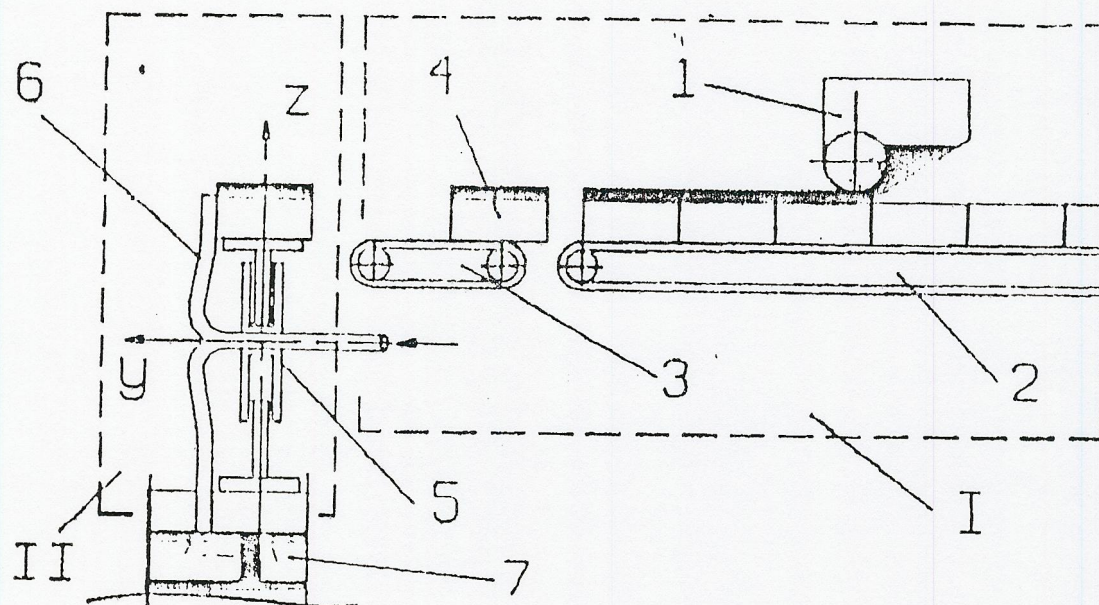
Schematic diagram of brick laying by a machine. 1 - extruder, 2 - feeder; 3 - accelerator; 4 - bricks ready for laying; 5 - working member (rotor); 6 - injection nozzles; 7 - finished wall.
